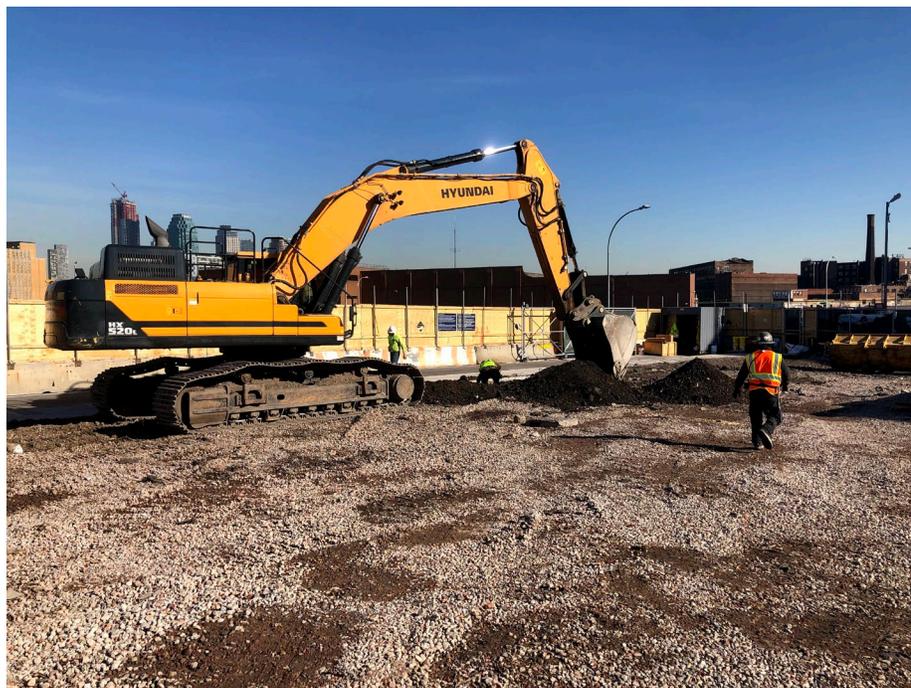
Looking east, New Leaf using excavator to trench in WCF-A2.
